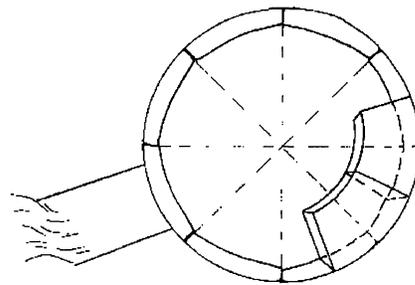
Alaskan Igloo Construction. Overhead view showing shape of snow blocks for roof and sleeping and cooking platform.
